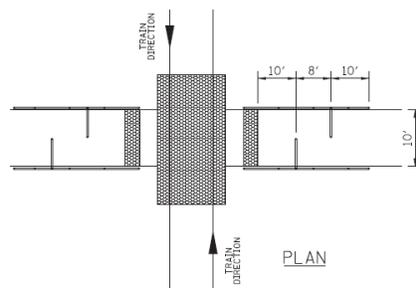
Proposed Plan's Pedestrian Barrier Details (sheet 19 of 88)
